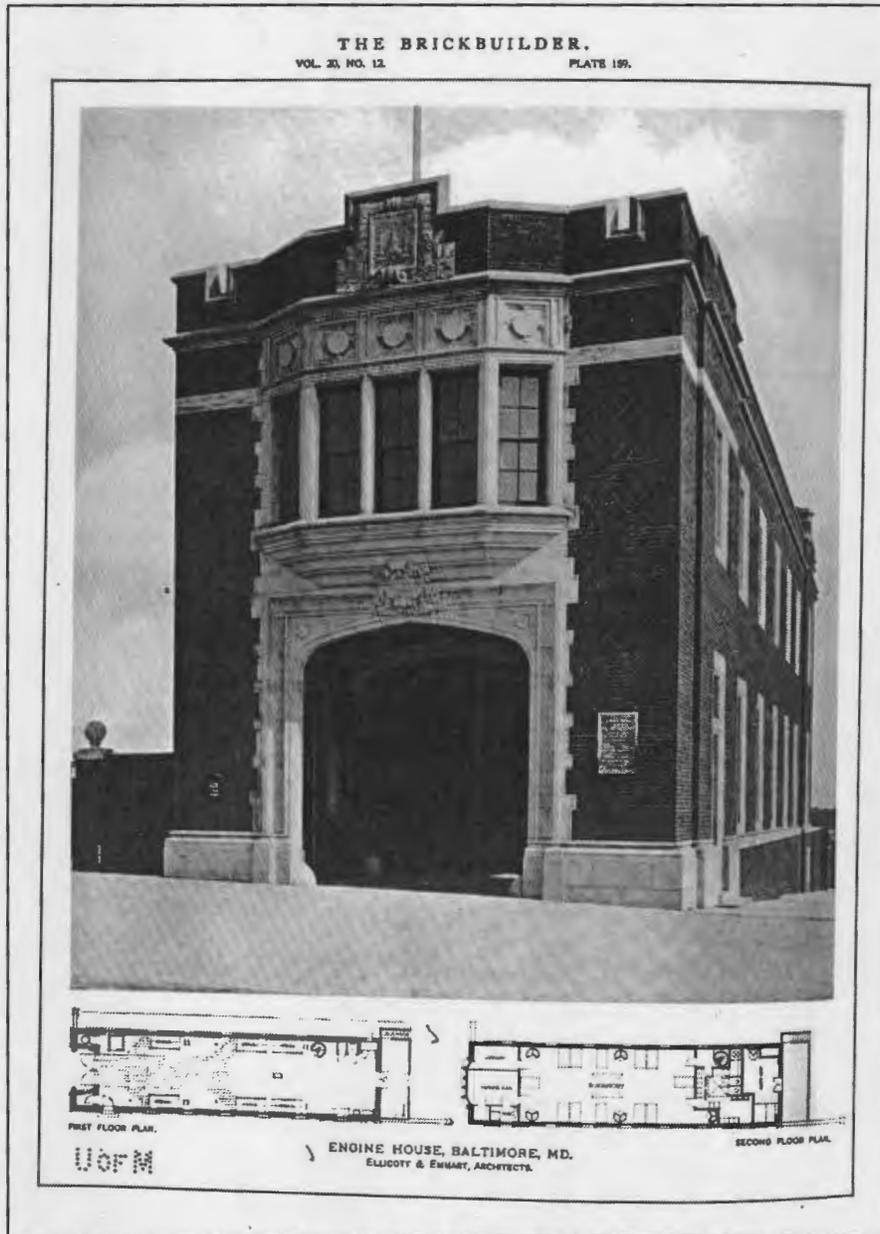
Published photograph and plans, shortly after construction of Fire Department Engine House No. 36 (*Bricklayer* 1911: plate 159, p. 280).
